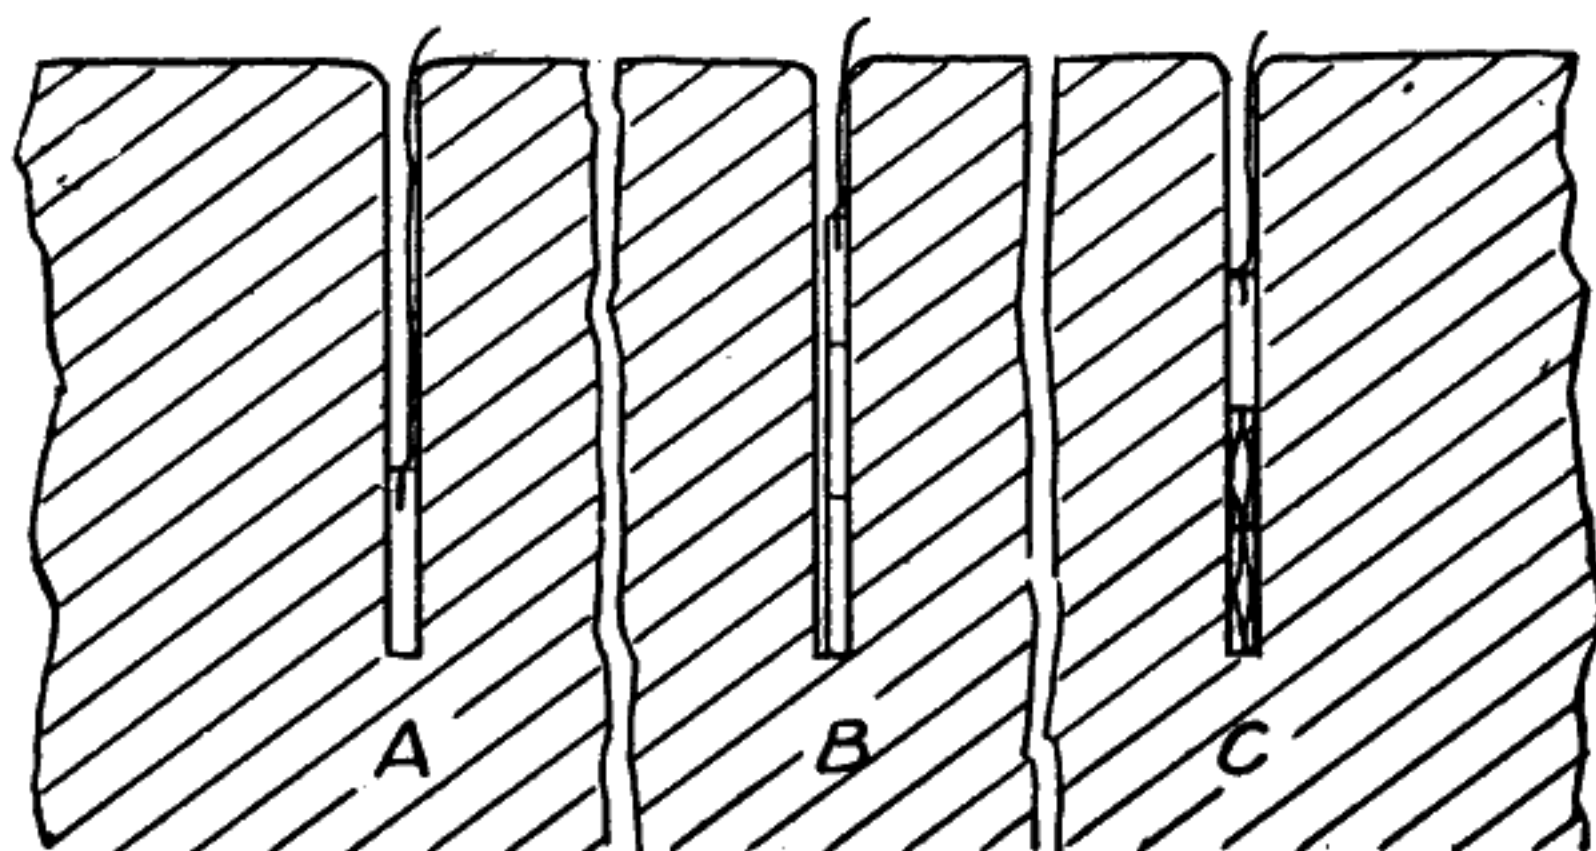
“A” shows a single (or a half) cartridge charge loaded into a bore hole. “B” shows several cartridges loaded into a hole without slitting paper wrapper in order to protect the explosive from moisture if the hole is wet. The primer should be at or next to the top and the cap should point toward the main part of the charge. “C” shows how, when the holes are dry, the cartridges are slit from end to end and pressed down to fill the entire diameter of the hole and leave no air spaces. The primer should not be slit.
